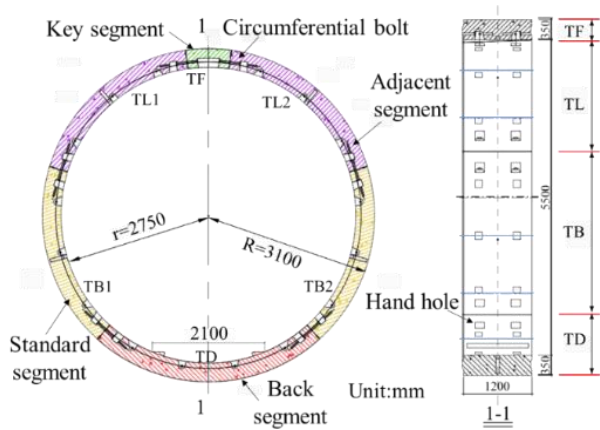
Cross-section and details of the shield tunnel in Shanghai Metro Line 2
